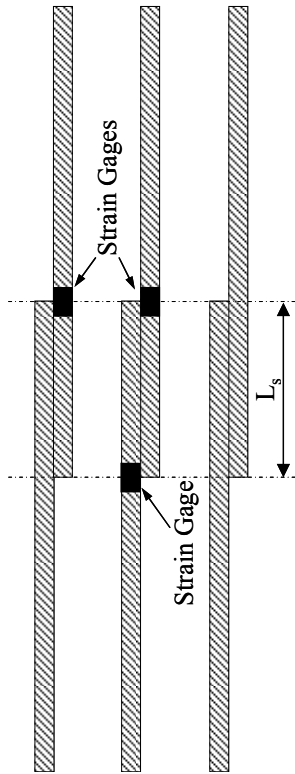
Plan View of Instrumentation Layout (Phase II)
